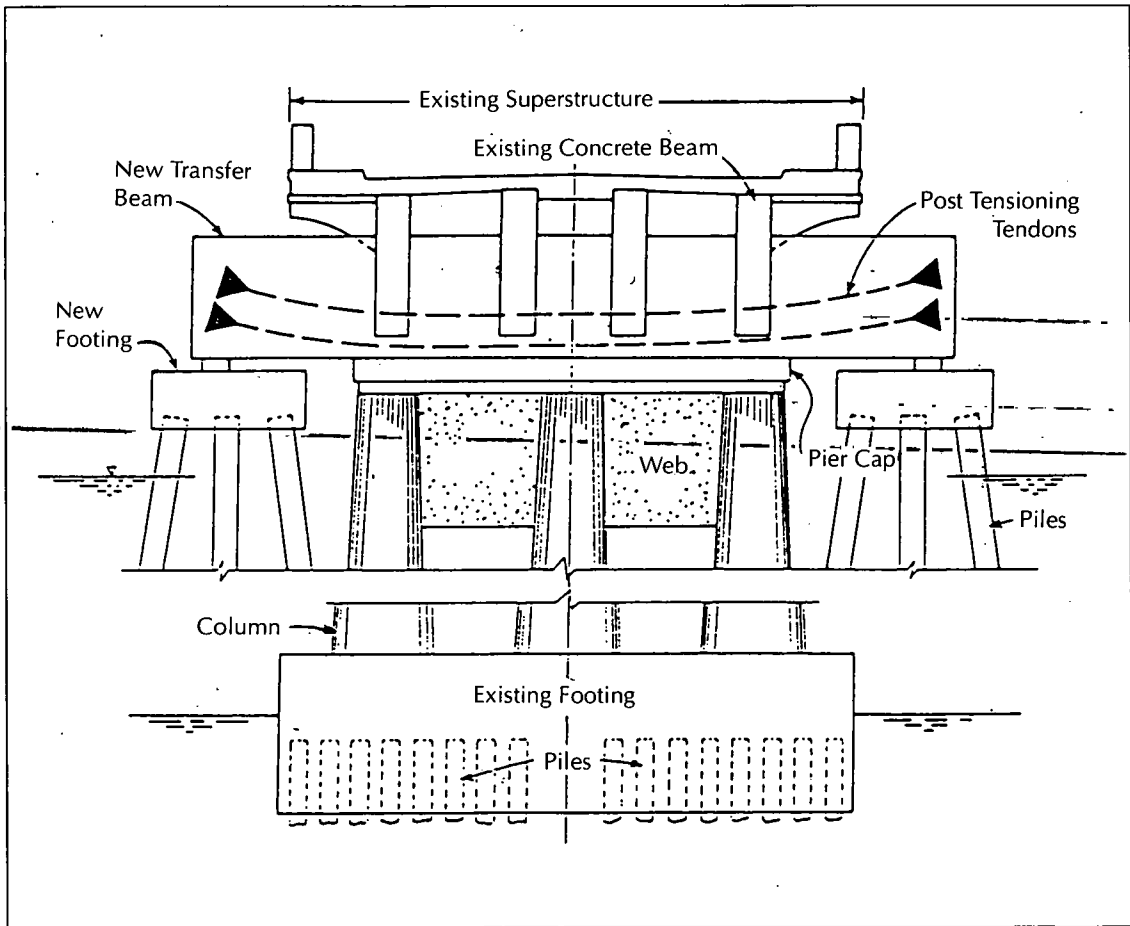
Foundation rehabilitation for the Ashley River Bridge.
